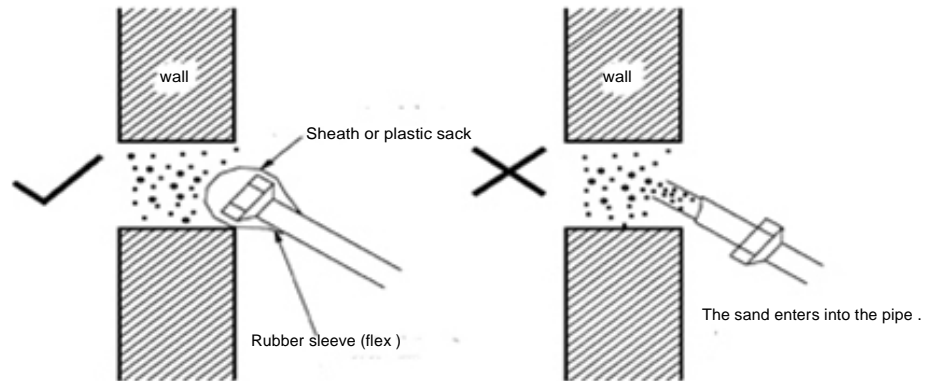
6 : Protection sketch map of the tubing for getting through the wall
